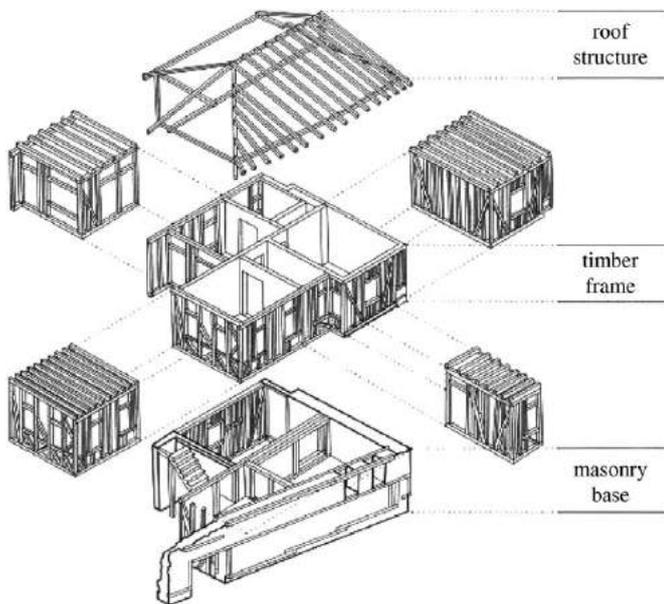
Sections of a timber-framed Anatolian house, an example from Ankara [1].
